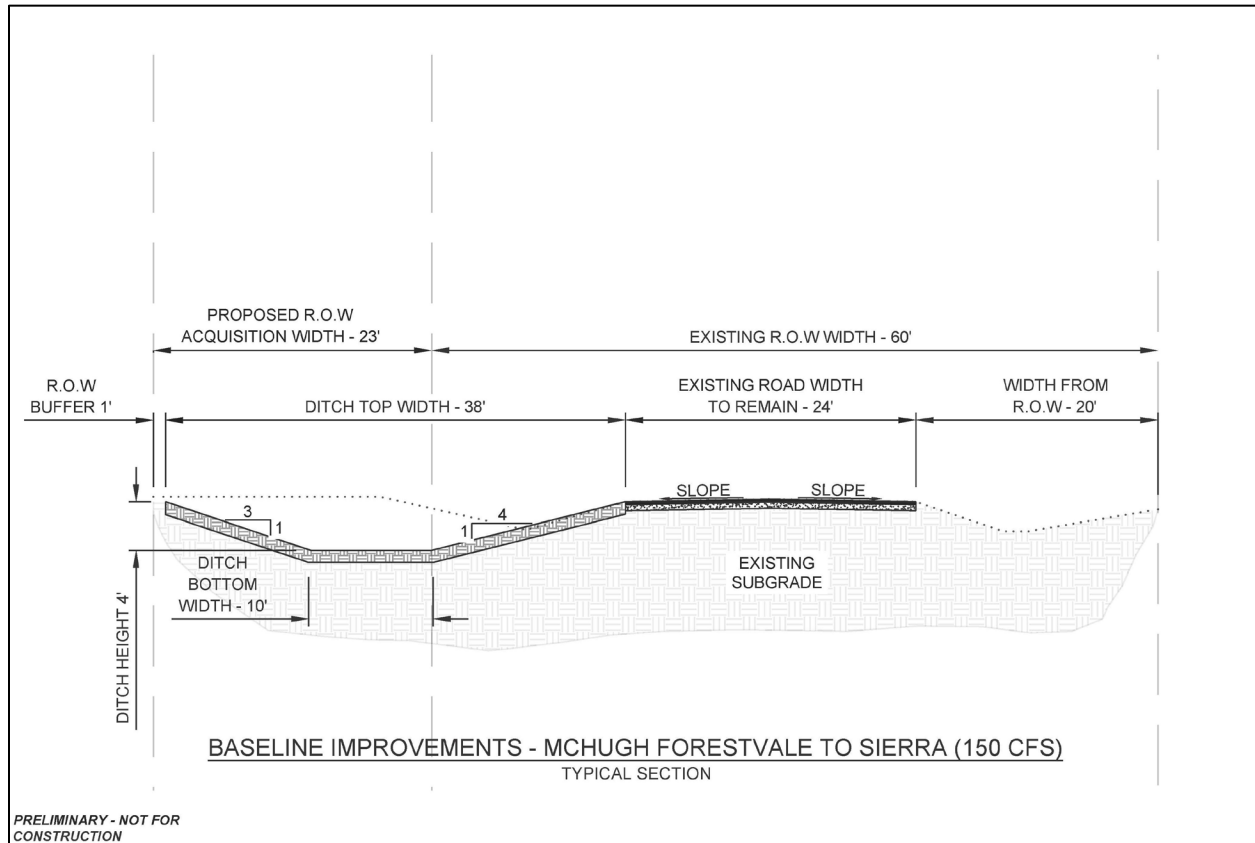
Typical section for the roadside ditch layout along McHugh Lane between the Forestvale Cemetery and Sierra Road.
